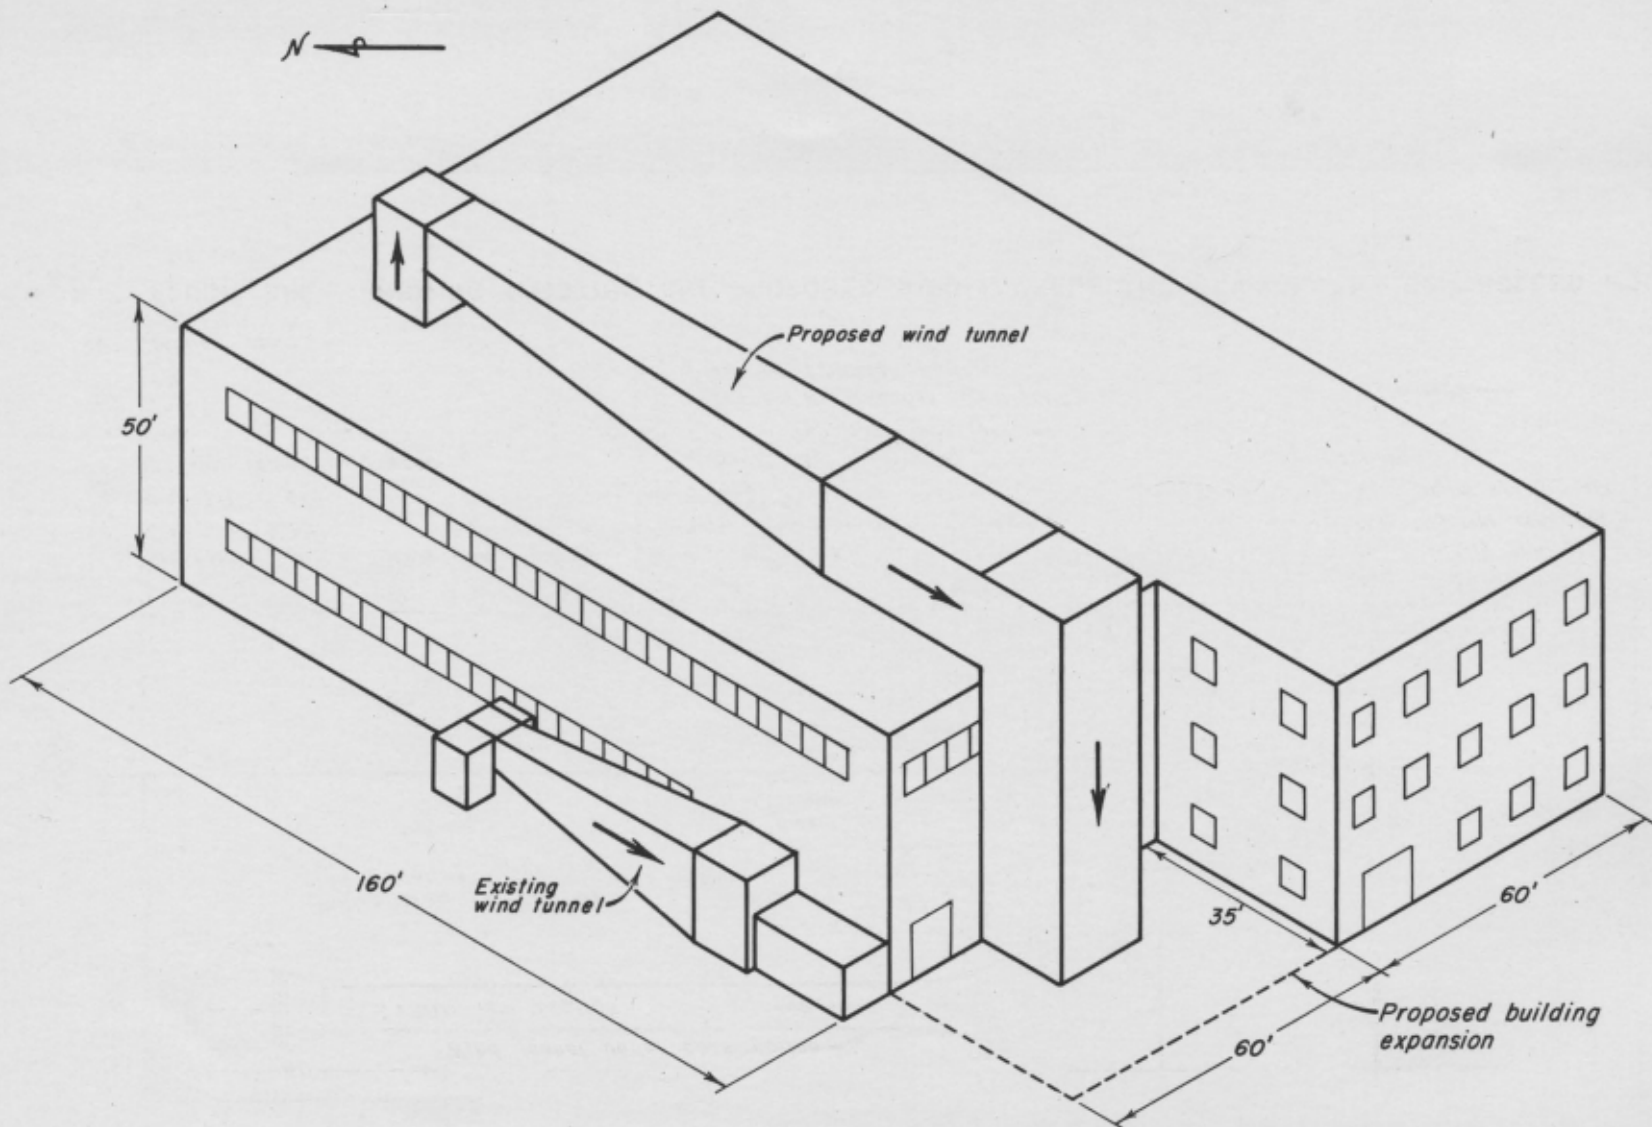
ISOMERTIC VIEW SHOWING WIND TUNNELS AND EXISTING AND PROPOSED APPURTENANT BUILDING
